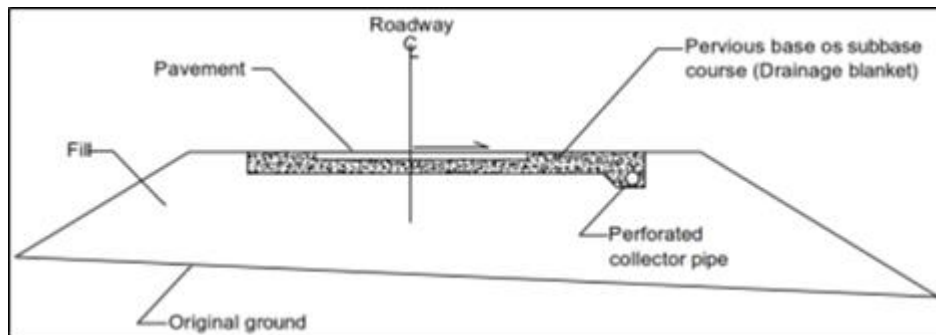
Illustration of a drainage blanket (for short sections of road only)
